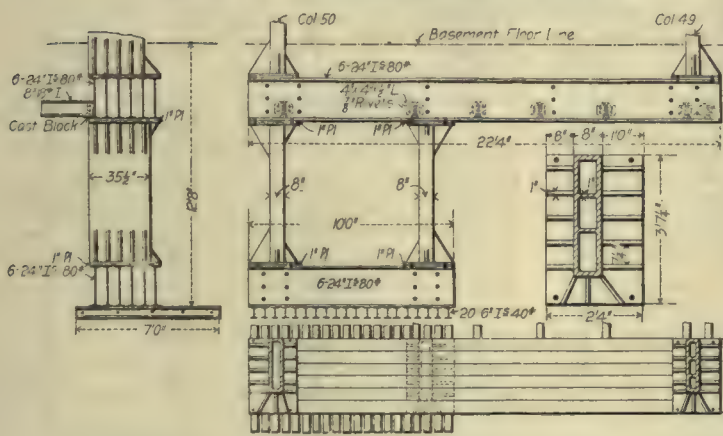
FOUNDATIONS FOR COLUMNS 49 AND 50.
